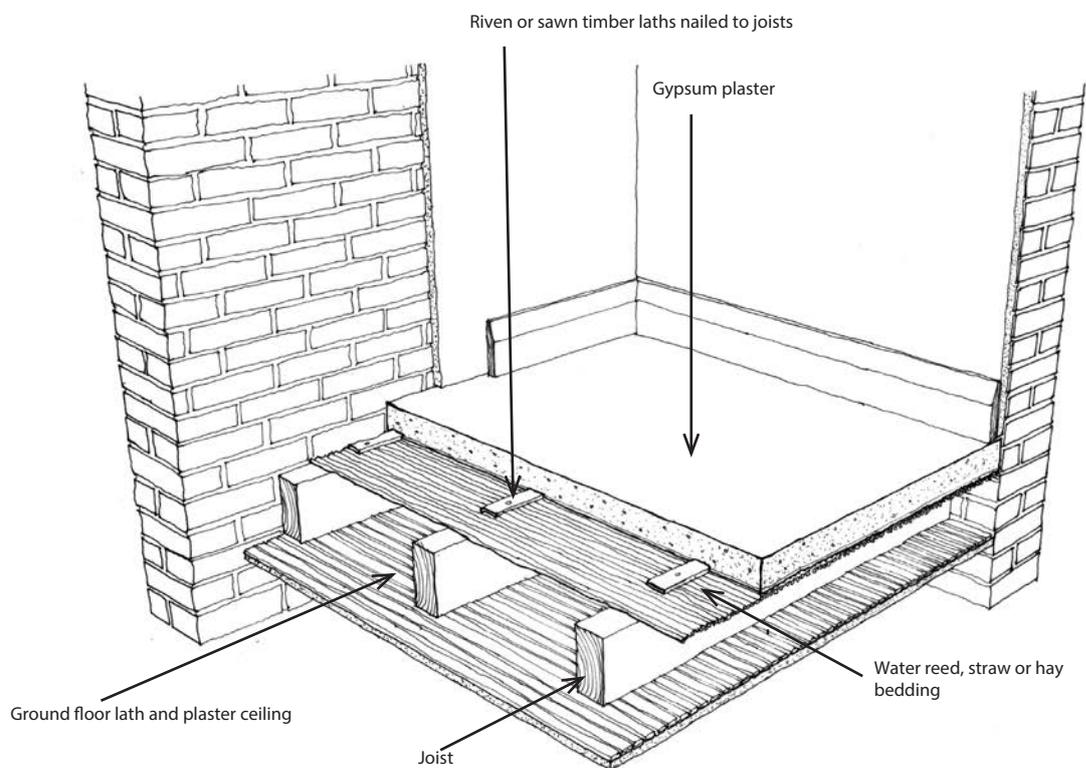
Cutaway of a typical gypsum plaster floor. Illustration: Ross Perkin
